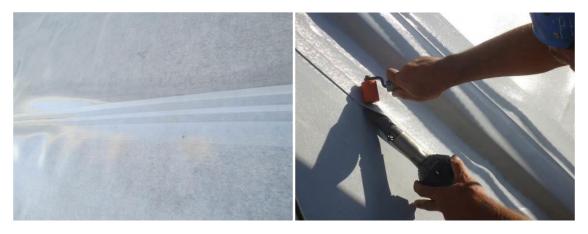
Implementation of P-PVC welding: double weld, manual weld
